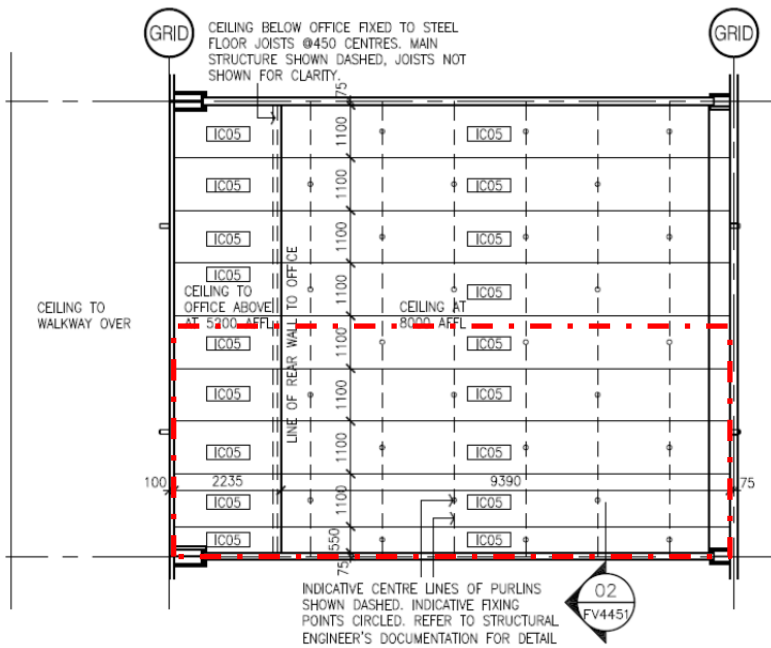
Indicative PIR panel ceiling layout (medium trading store / small store shown in red)
